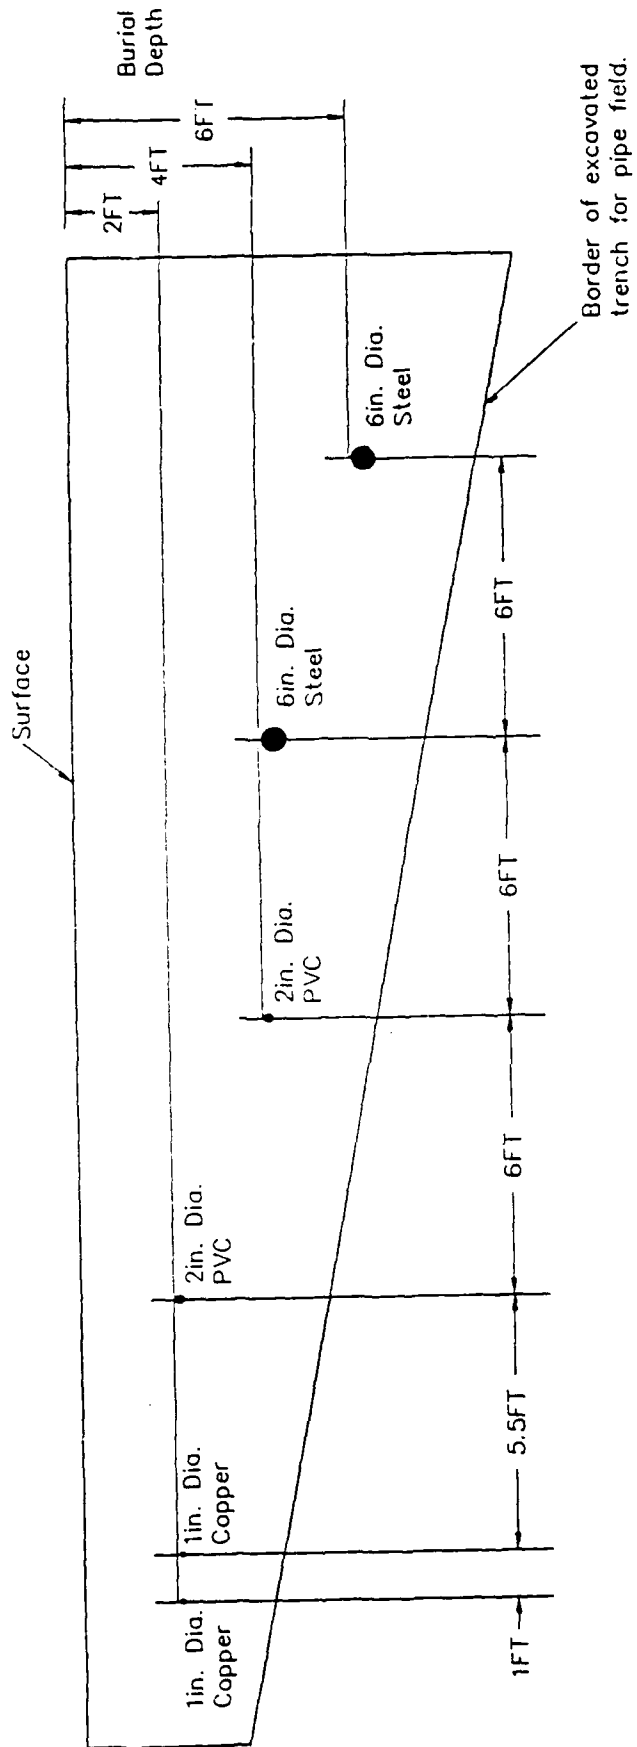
Side view drawing of pipe test field showing pipe sizes and locations.
